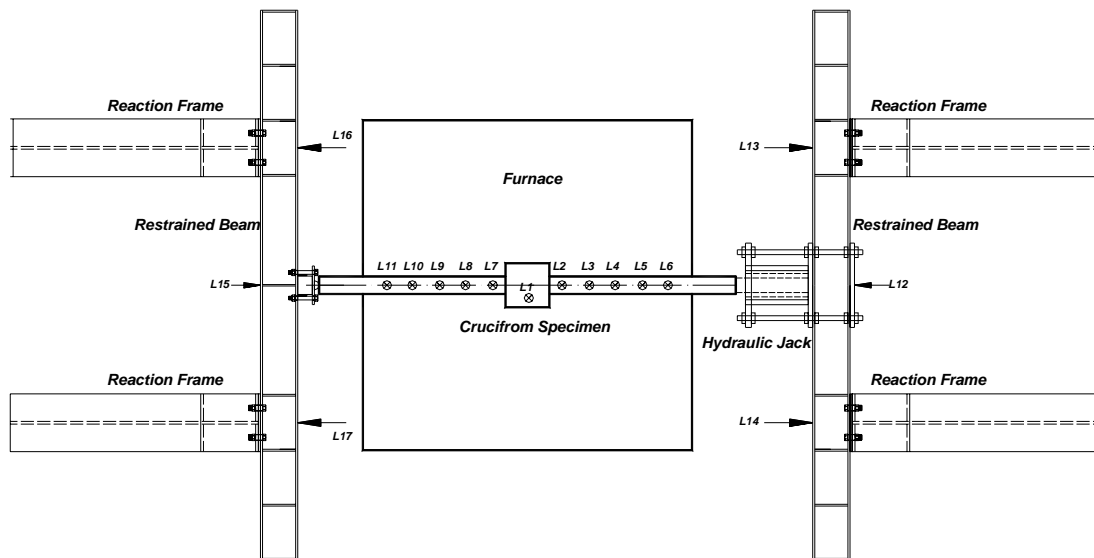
Plan View of Deflection Transducers Locations (CR1, CR2 and CR3)
